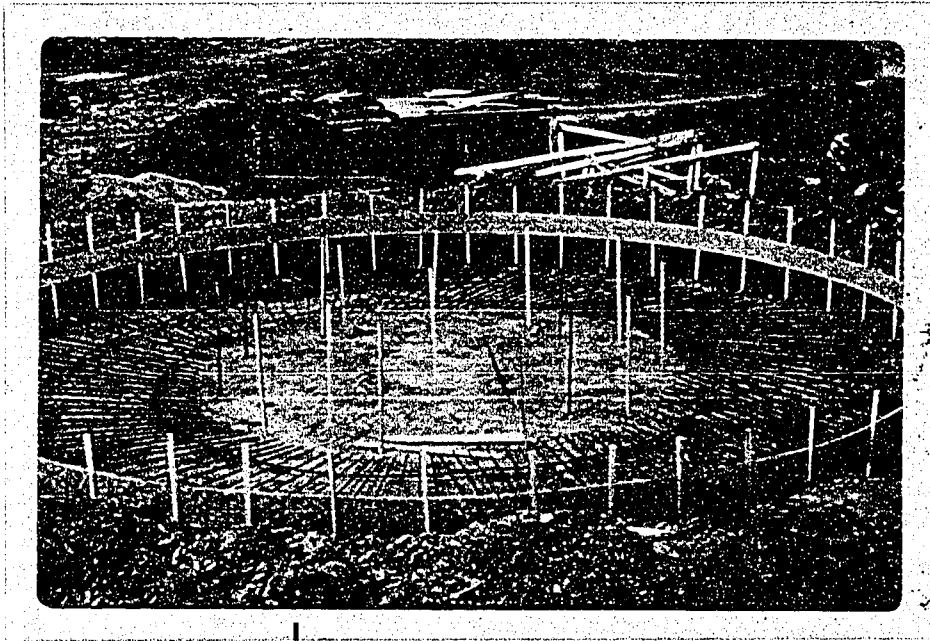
(a) Foundation bed with reinforcing steel and formwork in place.
